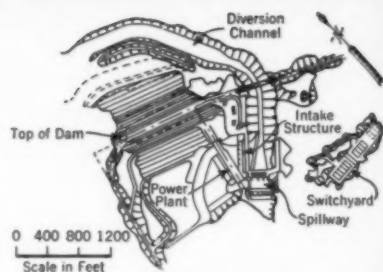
PLAN of Davis Dam shows final positions of earth fill, concrete intake structures, and switchyard.
